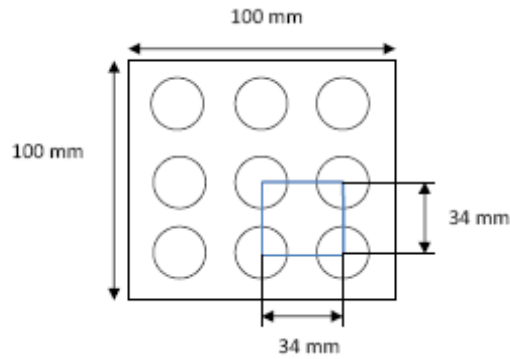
Arrangement of the PVC pipes in the “*Akar Foundation*” model (34 mm spacing)
